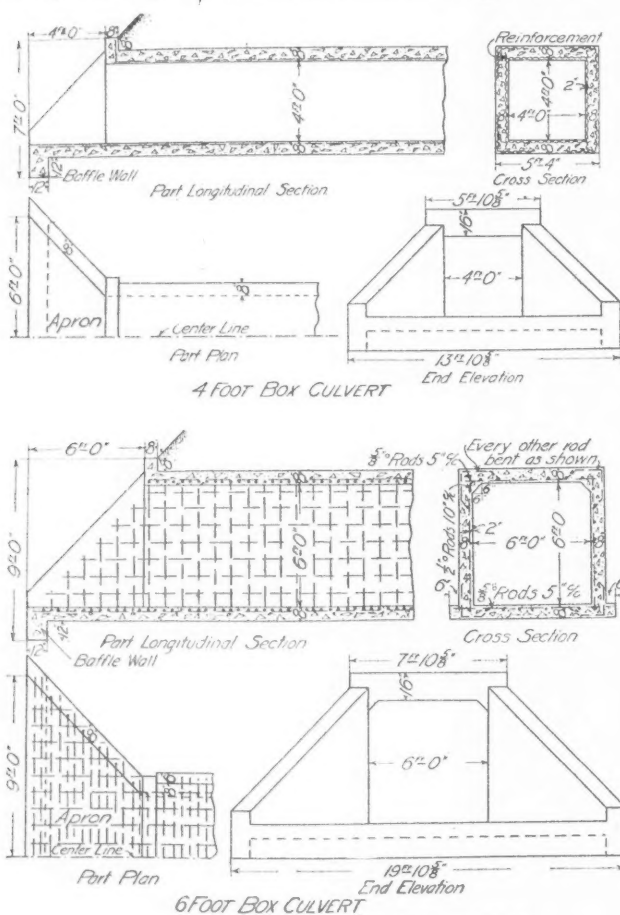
REINFORCED CONCRETE BOX CULVERTS
